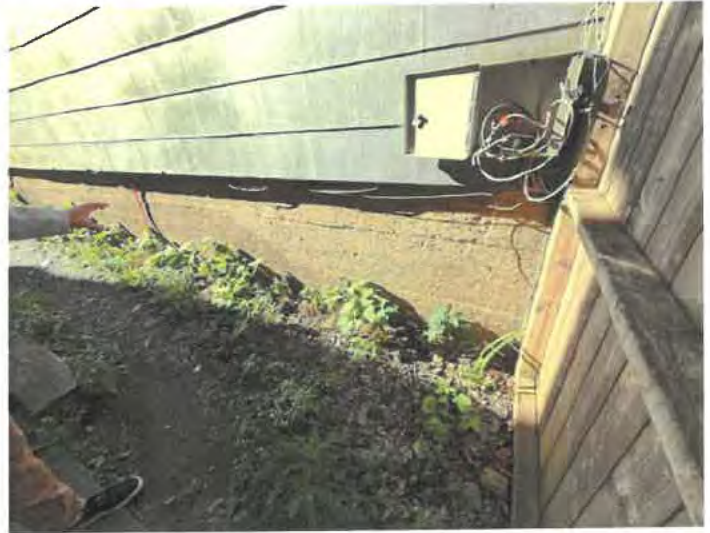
Board formed foundation with surface deterioration of concrete.
